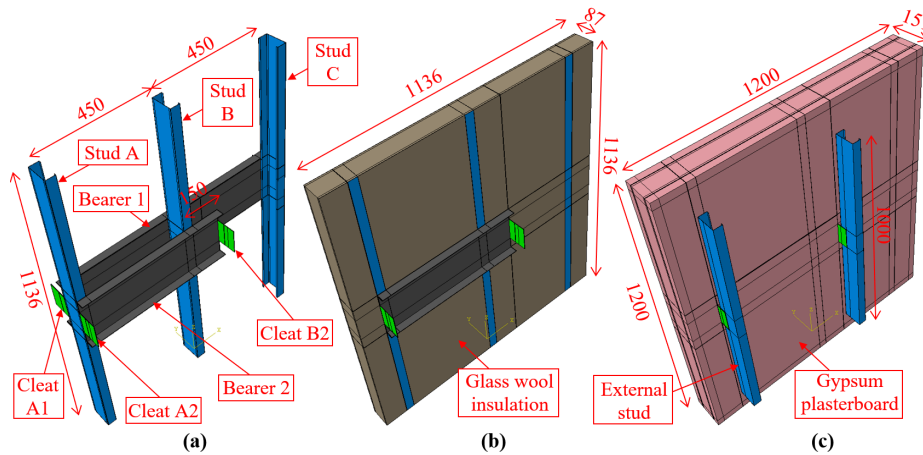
Thermal FE model of the wall specimen with (a) glass wool insulation and gypsum plasterboards hidden, (b) gypsum plasterboards hidden, and (c) all details.
